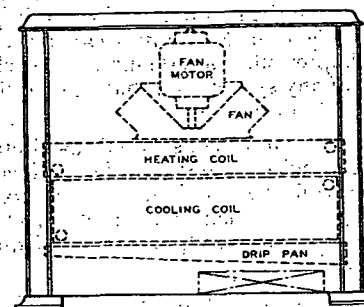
REMOTE FLOOR TYPE ROOM UNIT AIR CONDITIONER
